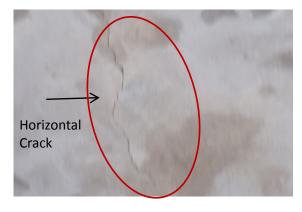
Horizontal Crack on Vrandah Roof of Shop No. 326B,(G.F.), Approx. Width = 0.35mm, Approx. Length = 2.0m. Distance from L.H. Column = 1.20m,Height from Floor =3.00m.
